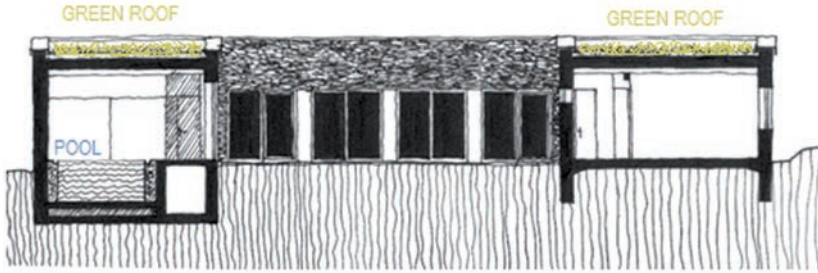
The cross section through the atrium. Design and drawing: M. Nedvěd
